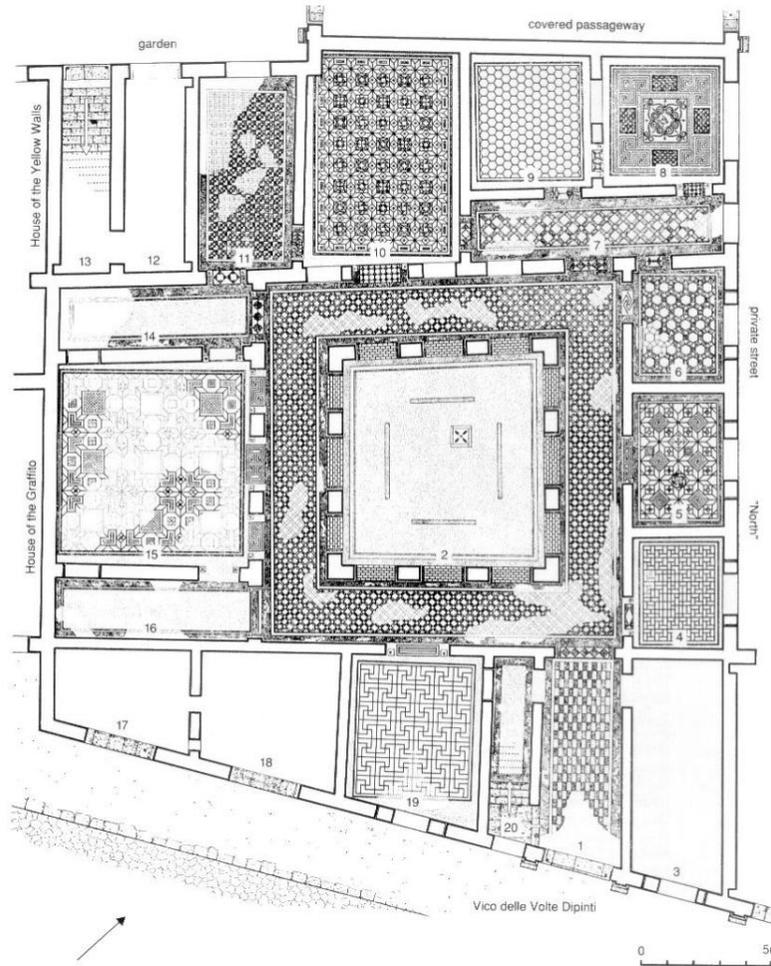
Plan of the House of the Muses. After Clarke 1991.
